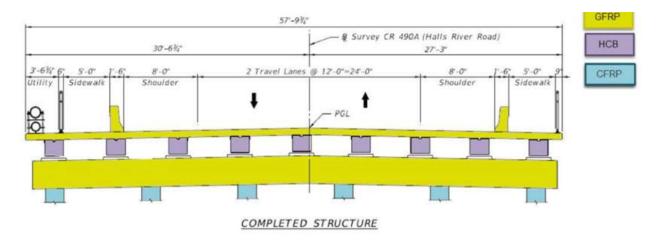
Profile view of Halls River Bridge replacement (FDOT 2016)
